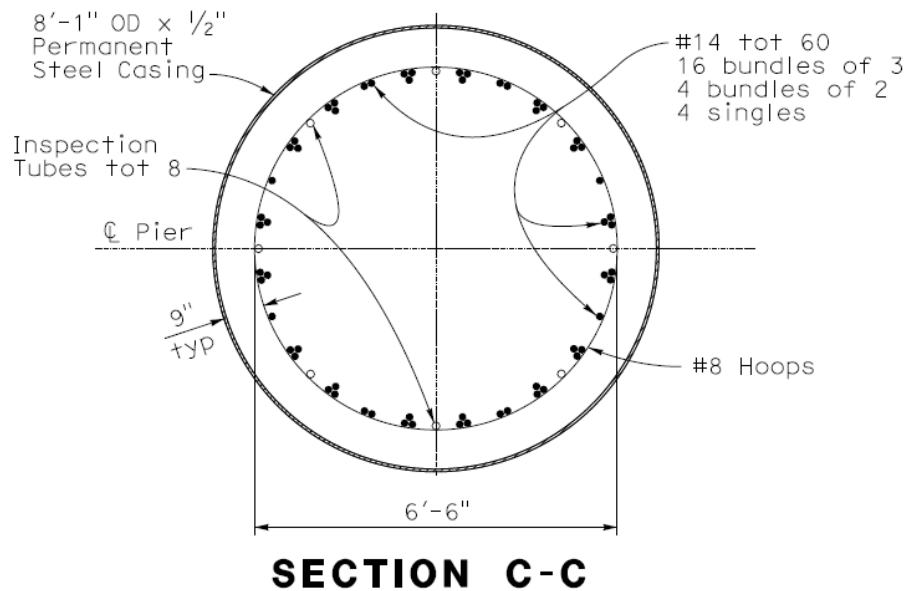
Column-Shaft Reinforcement Details (not to scale)
